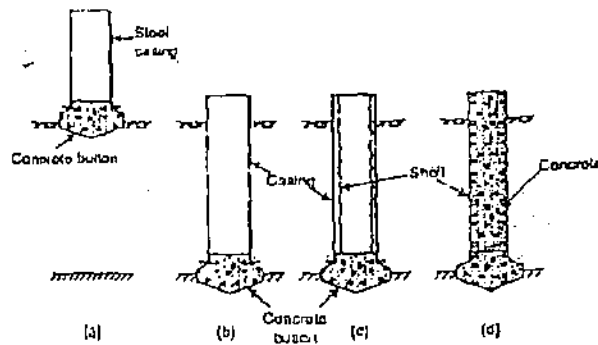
STAGES IN BUTTON BOTTOM PILE CONSTRUCTION.
